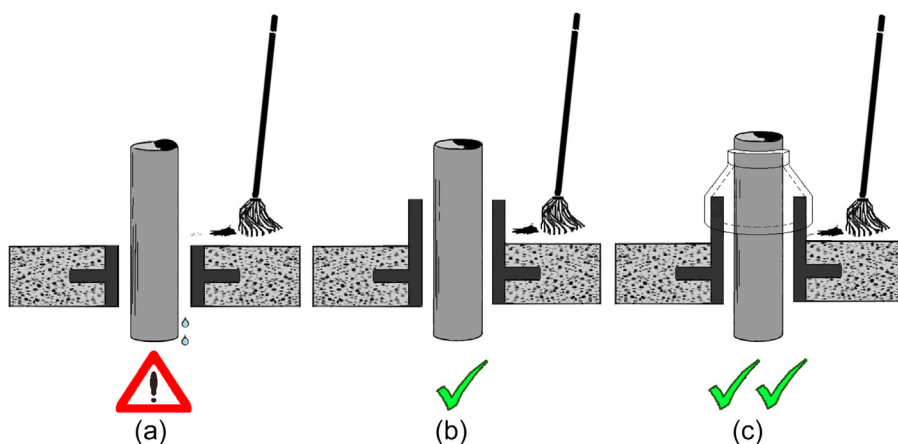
(a) Cleaning solutions may get spilled to a lower floor. (b) Openings in floors for pipes should be guarded with a sleeve. (c) With the use of a sleeve boot for single pipe floor penetrations there is no floor opening left (Moerman, 2011c).
